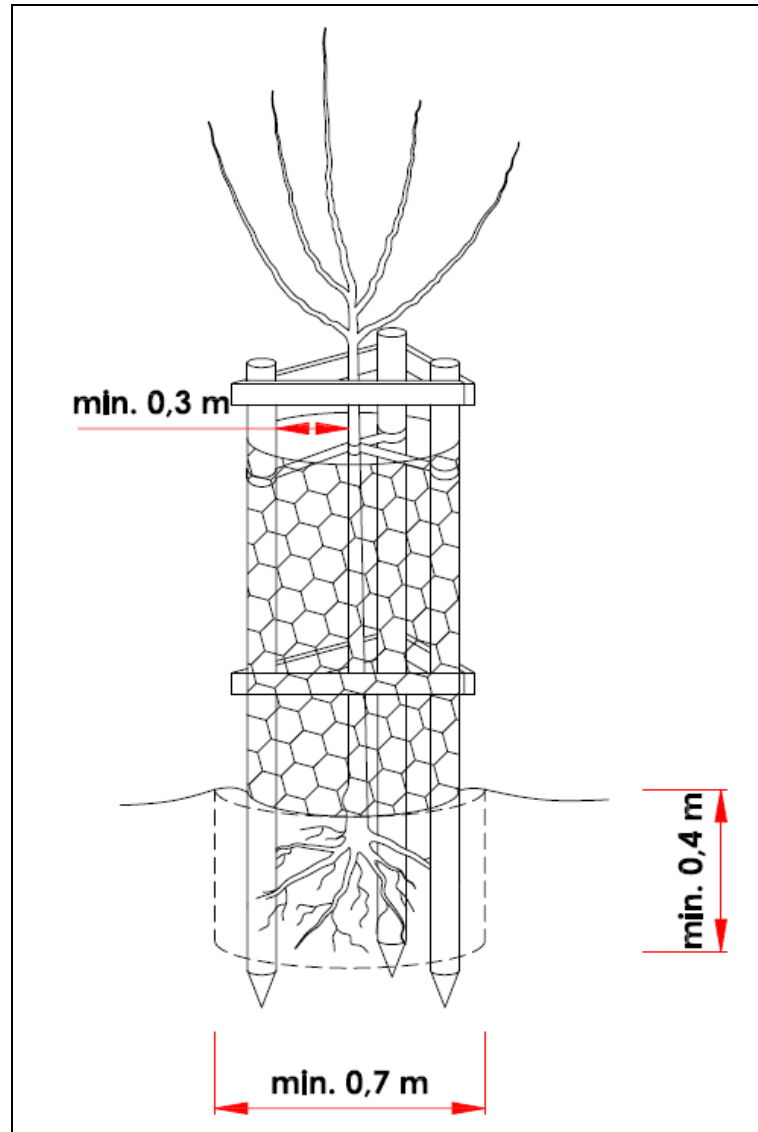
Trunk protection in multiple-stake anchoring, design examples (wire mesh, wood) (5.7.5).
